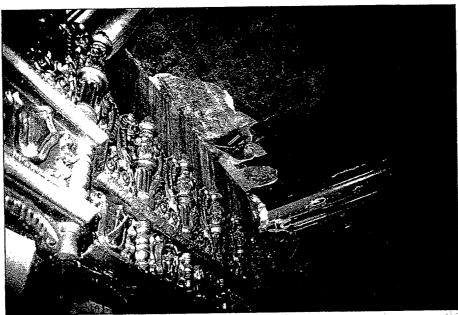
Golden Gate Theater, interior, detail view southeast from balcony showing ceiling and ornament damage (typical) (Chattel Architecture 2009)
